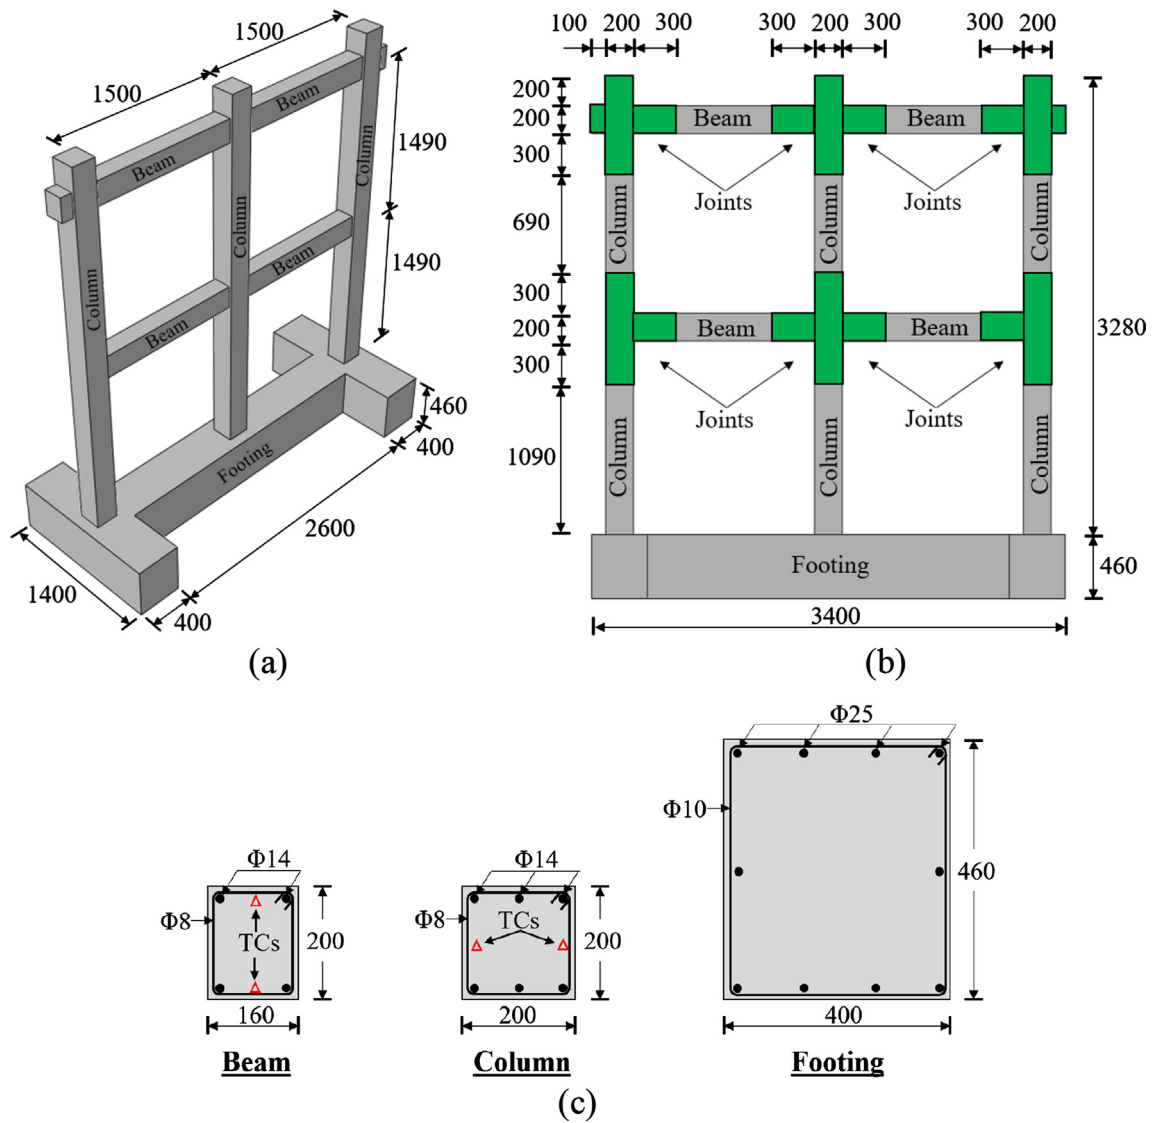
Dimension and reinforcement of frame specimens (unit: mm): (a) perspective view; (b) elevation view; (c) reinforcement in cross sections.
